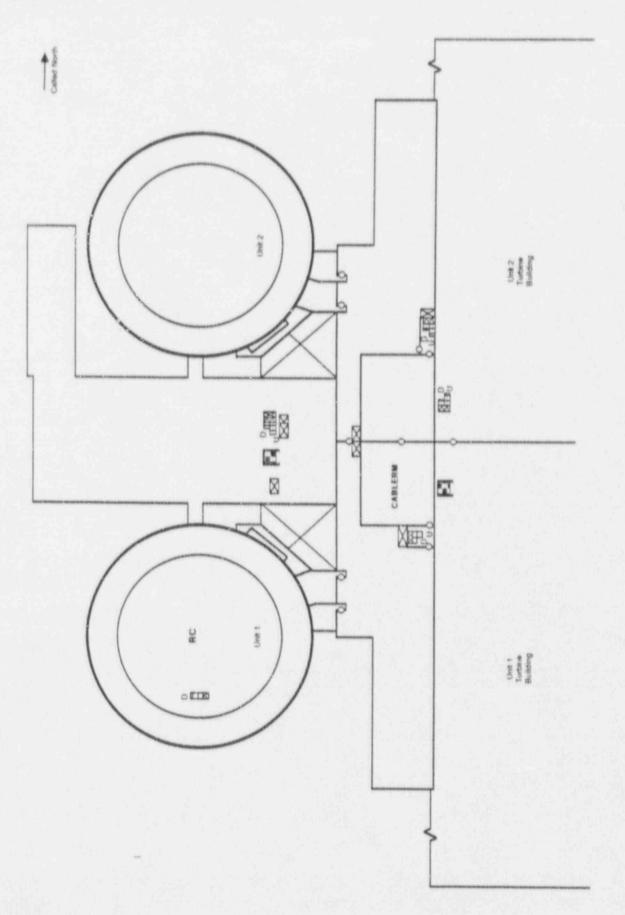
Zion 1 and 2 General Arrangement, Elevation 630"
